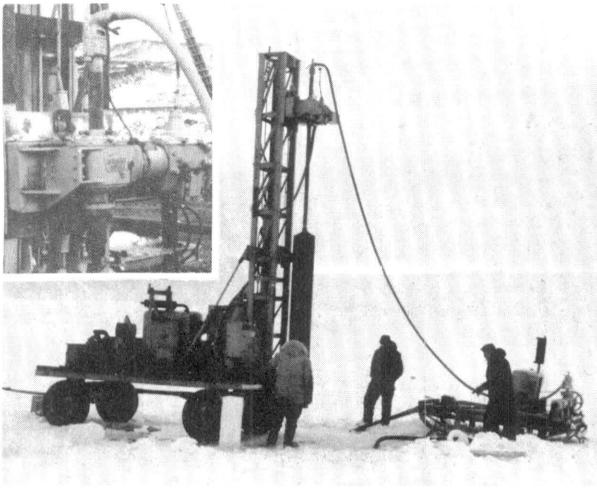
Mobile rotary drilling unit; drivehead and fluid swivel shown in inset.
